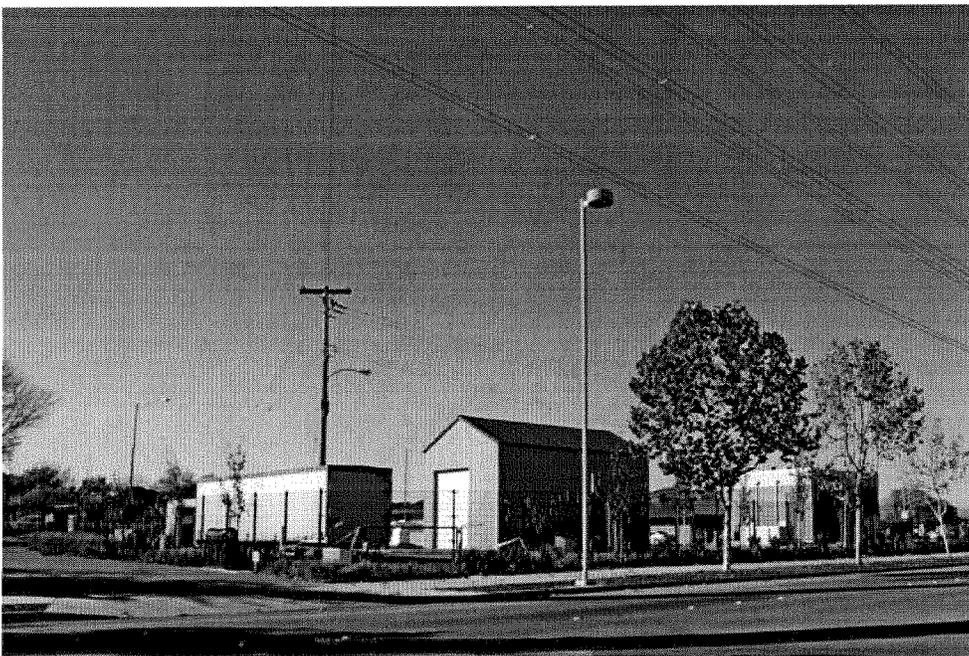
View from North McCarthy Boulevard of the existing sewer lift station facility between project sites B and C.
